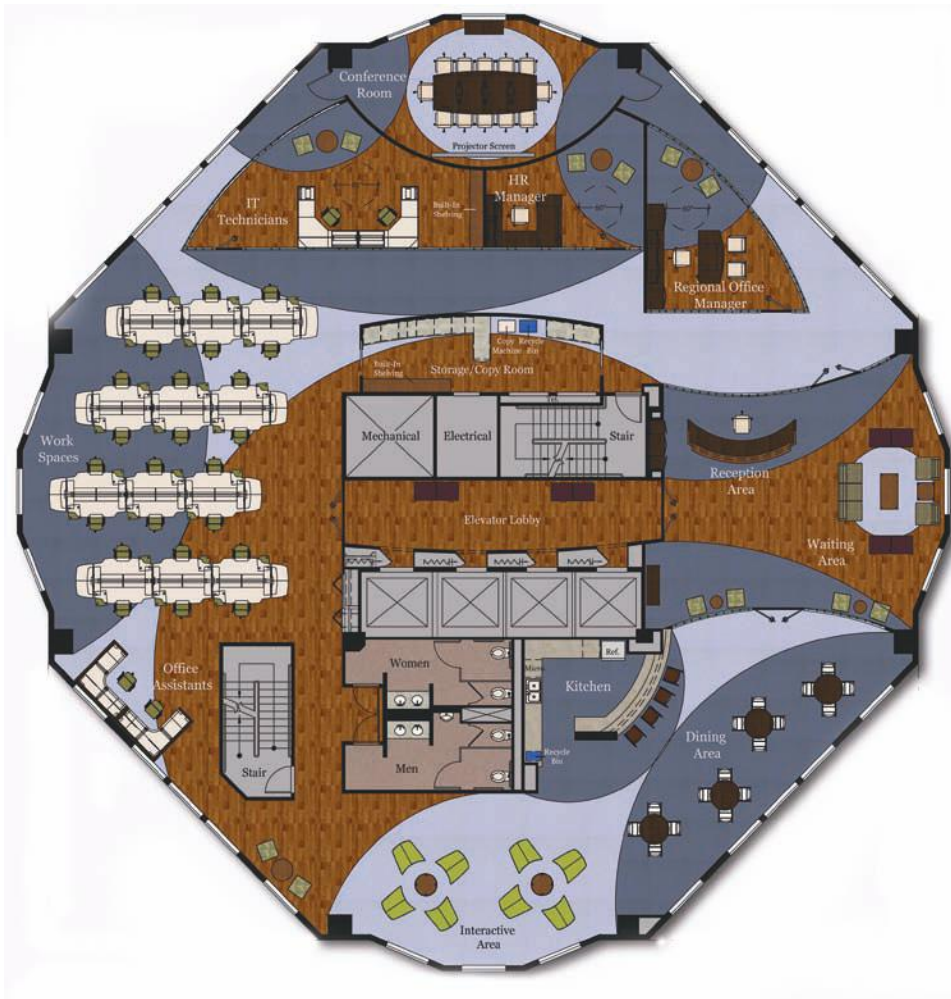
Final presentation floor plan of an office is drawn to scale with furniture and floor textures added.
